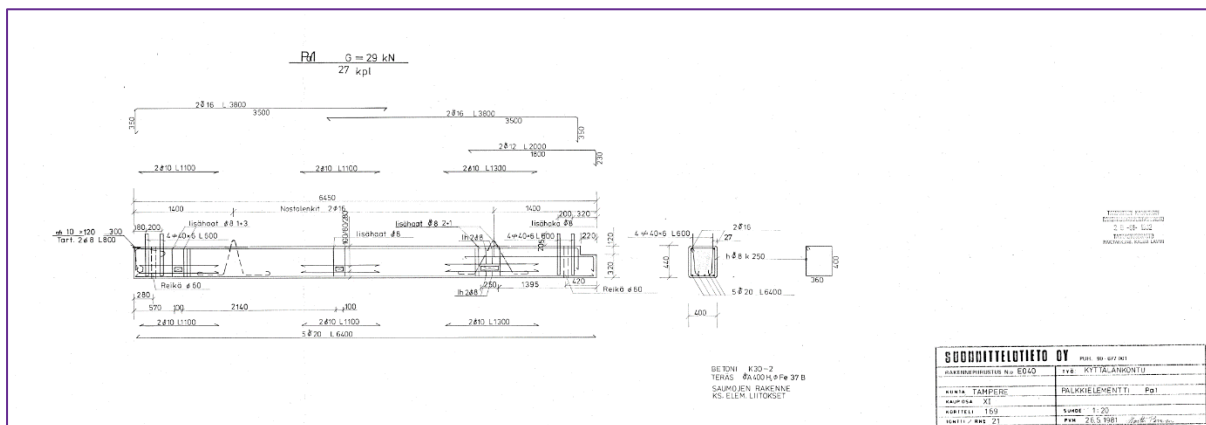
Original detail drawing of precast concrete beam (source: City of Tampere archives).
